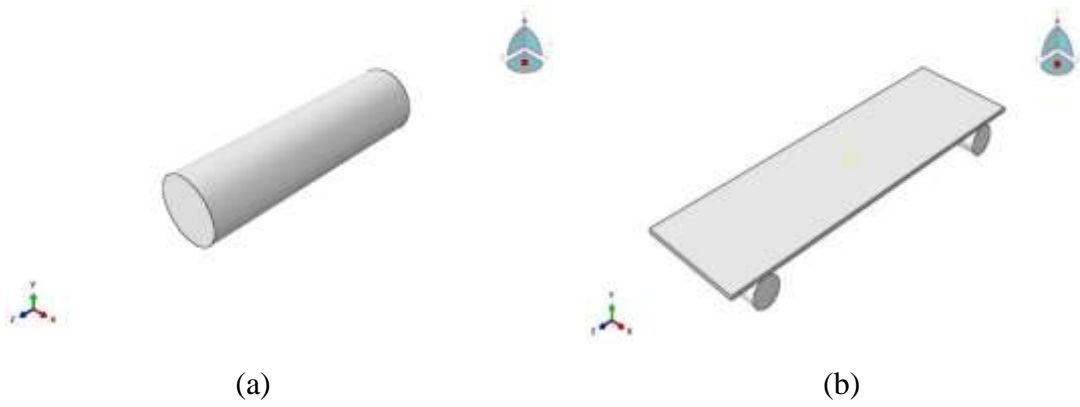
4 : (a) Bottom roller support of the beam model as 3D solid element, (b) Loading shell at the top of the beam model as 3D discrete rigid
